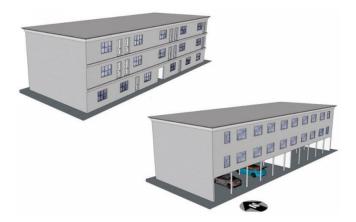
Elevations of the design example long-side-open building (credit: FEMA P-2006).
